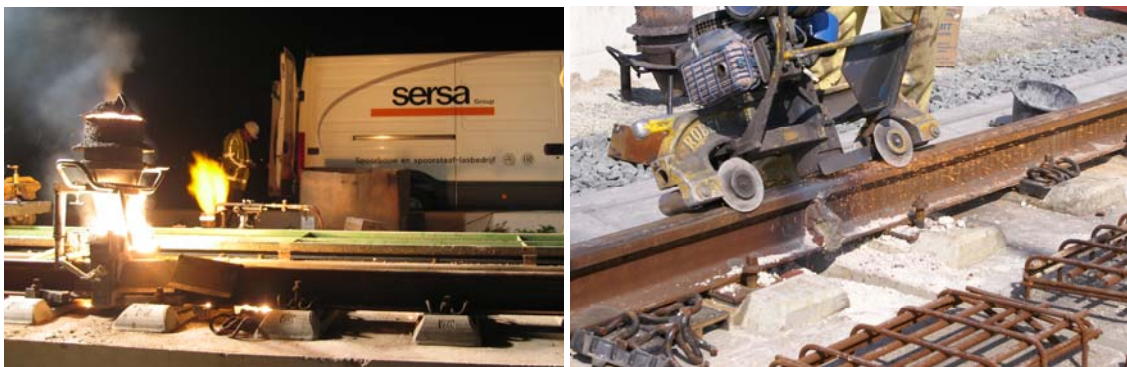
Aluminothermic rail welding and manual pre-grinding on the HSL-South
